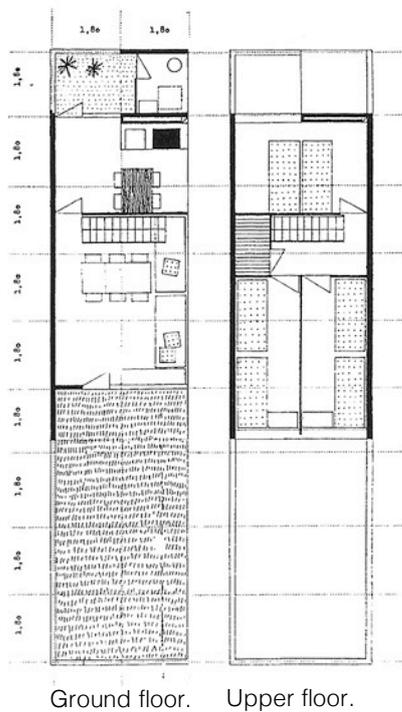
Directed Settlement of Entrevías*. Elevation plans of the dwellings.
